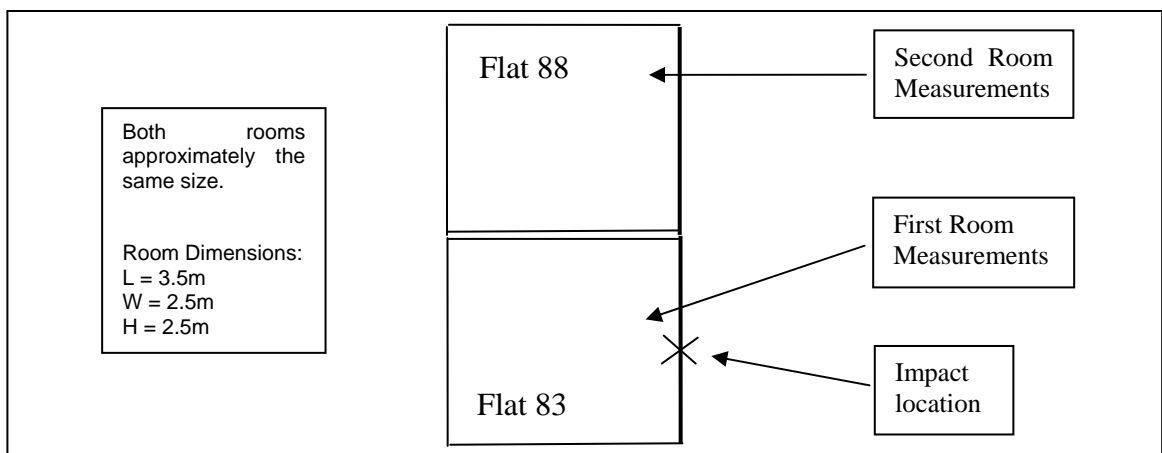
Sketch of test location at test site 2. Elevation view of first and second floor.
